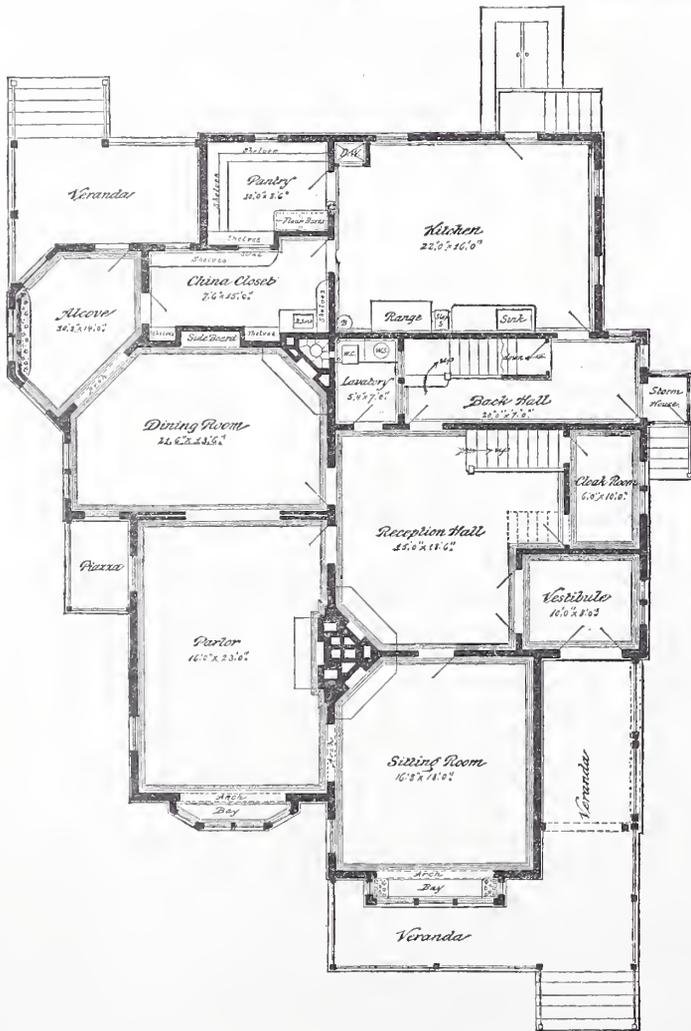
First Floor Plan, Submitted by "Convenience" (No. 144).—Scale, 1-16 Inch to the Foot.
